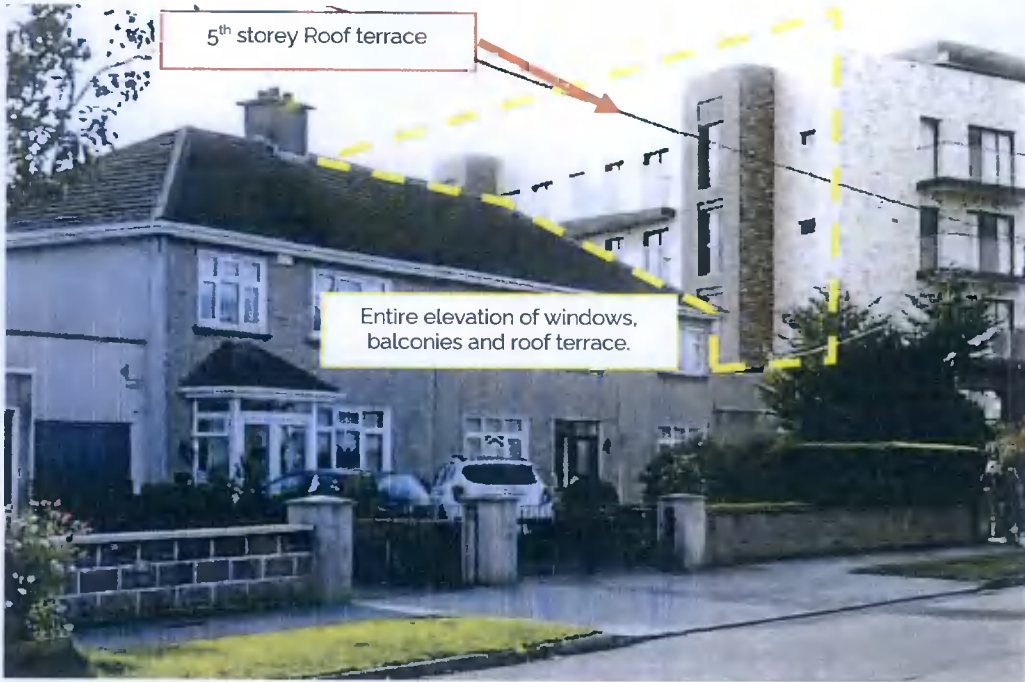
Scheme's Elevation 3 with overlooking windows, balconies & roof terrace from storeys 2 to 5
